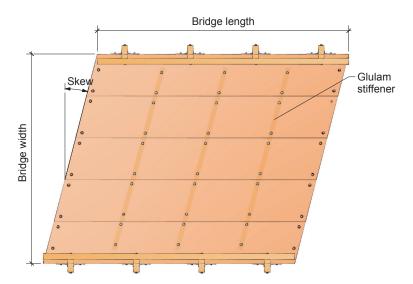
Longitudinal glulam deck plan skewed. Stiffeners run parallel to the skew.
